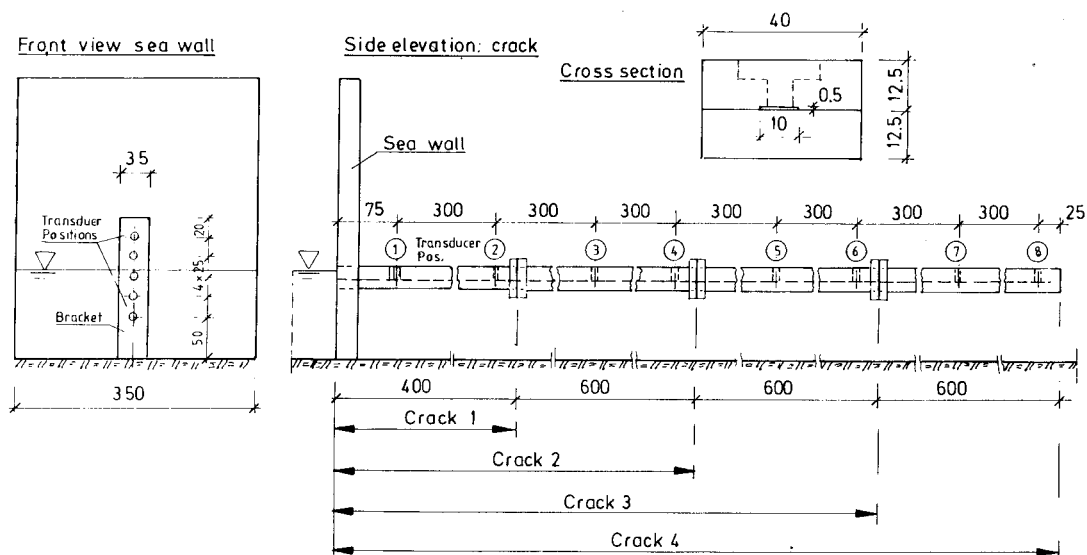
Crack models 1 – 4 (all dimensions in mm)
